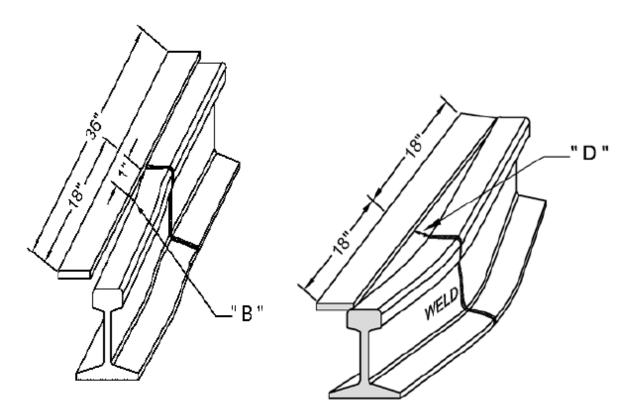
Dip Camber Tolerance at a Thermite or Flash Butt Weld
